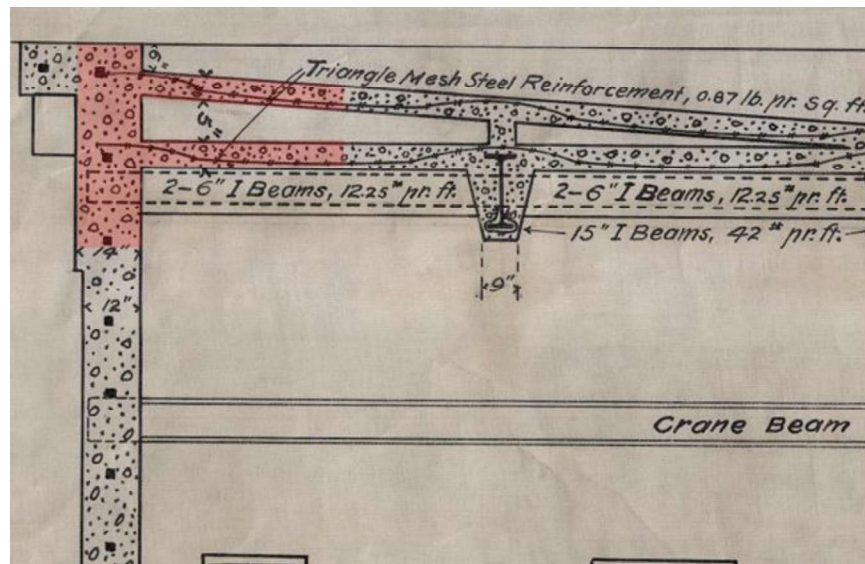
Inadequate Roof Diaphragm To Shear Wall Connection
